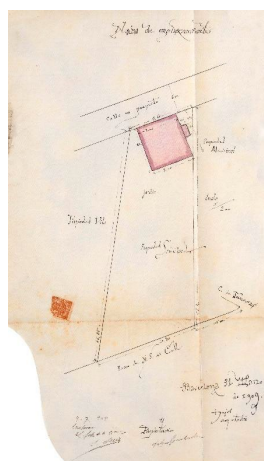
Location plan presented to the town hall, 1909. Source: Arxiu Municipal Contemporani de Barcelona.
